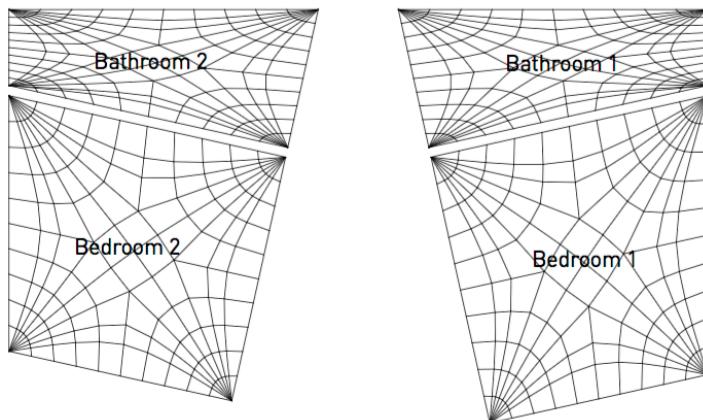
Geometry of the four floor slabs including rib patterns[93]
